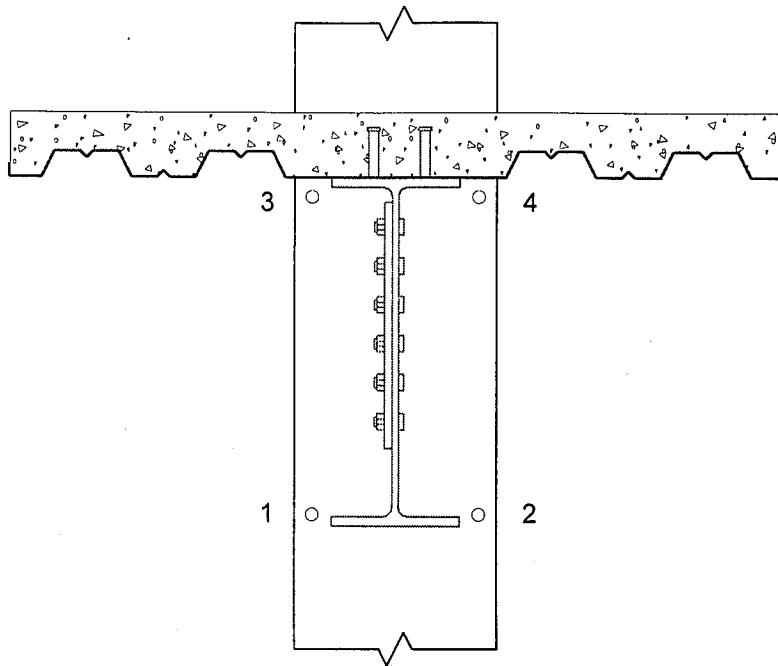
AE Transducer Locations (East Connections of Specimens 2 and 3)
